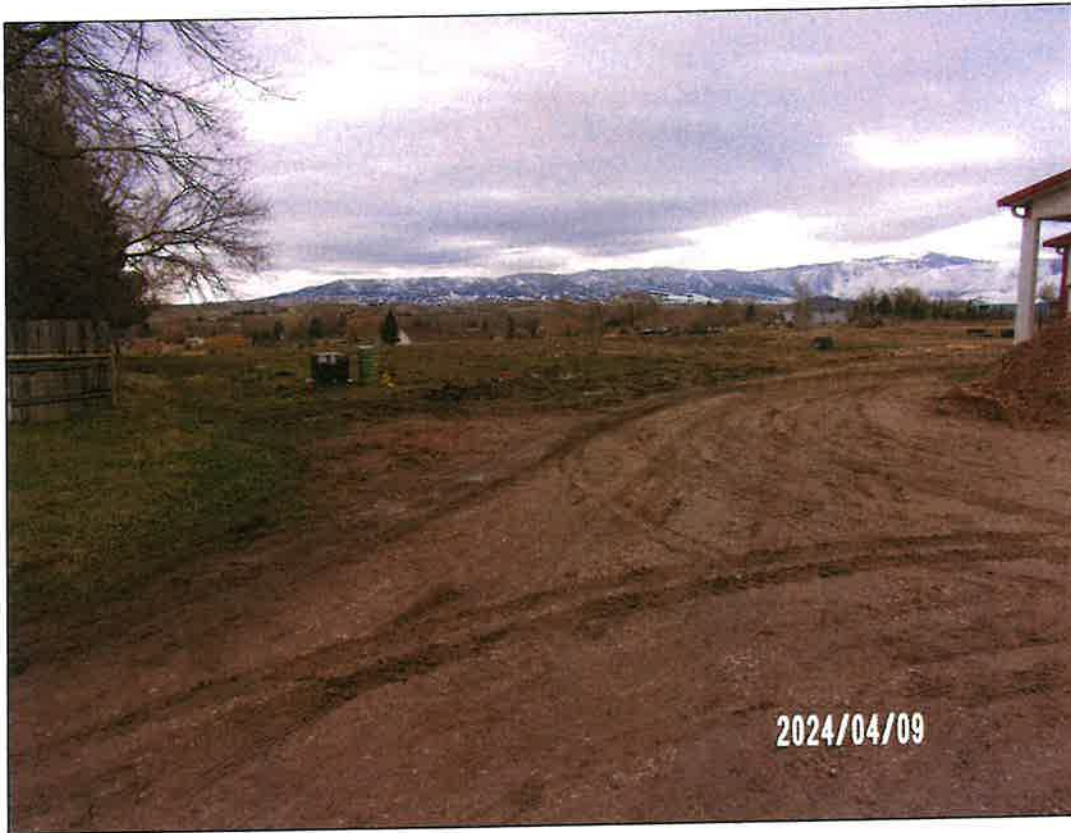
Residential lot area (looking southwest from proposed Sycamore Ln @ Tr. 1)
